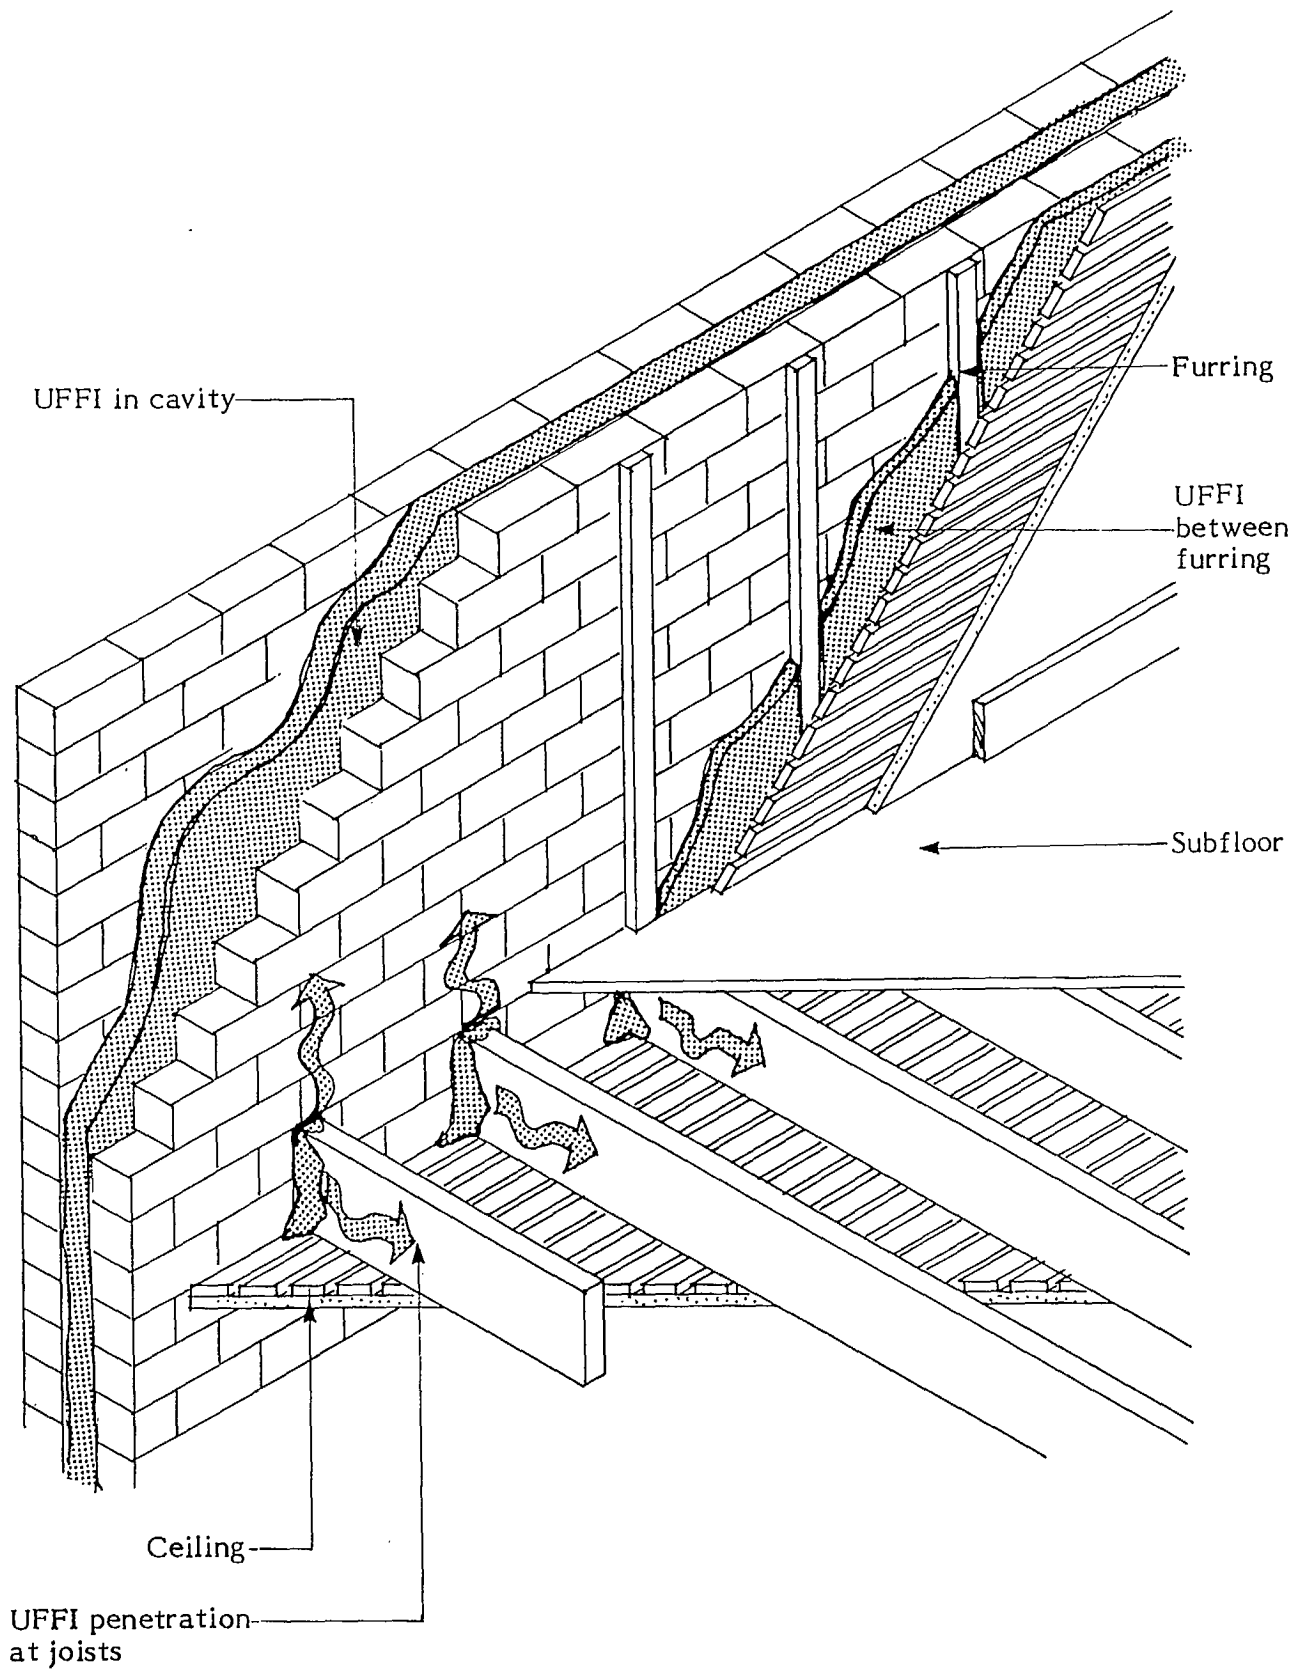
BRICK/CONCRETE BLOCK CAVITY WALL
